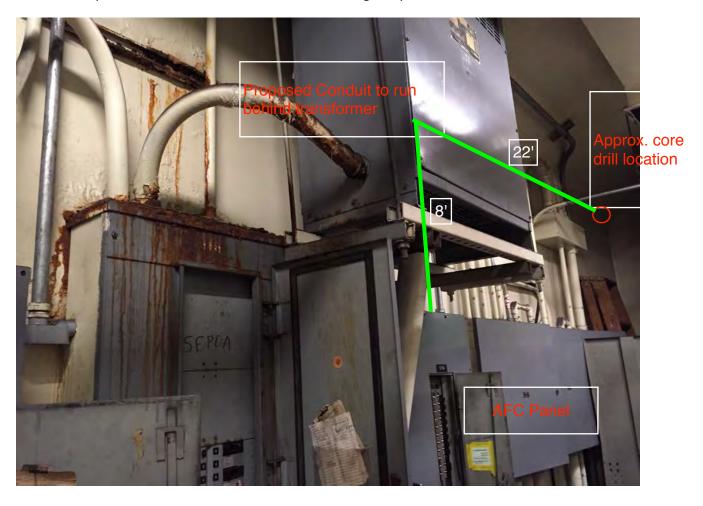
Existing Duct and Proposed Conduit feeding AFC panel SEMA in room 201
